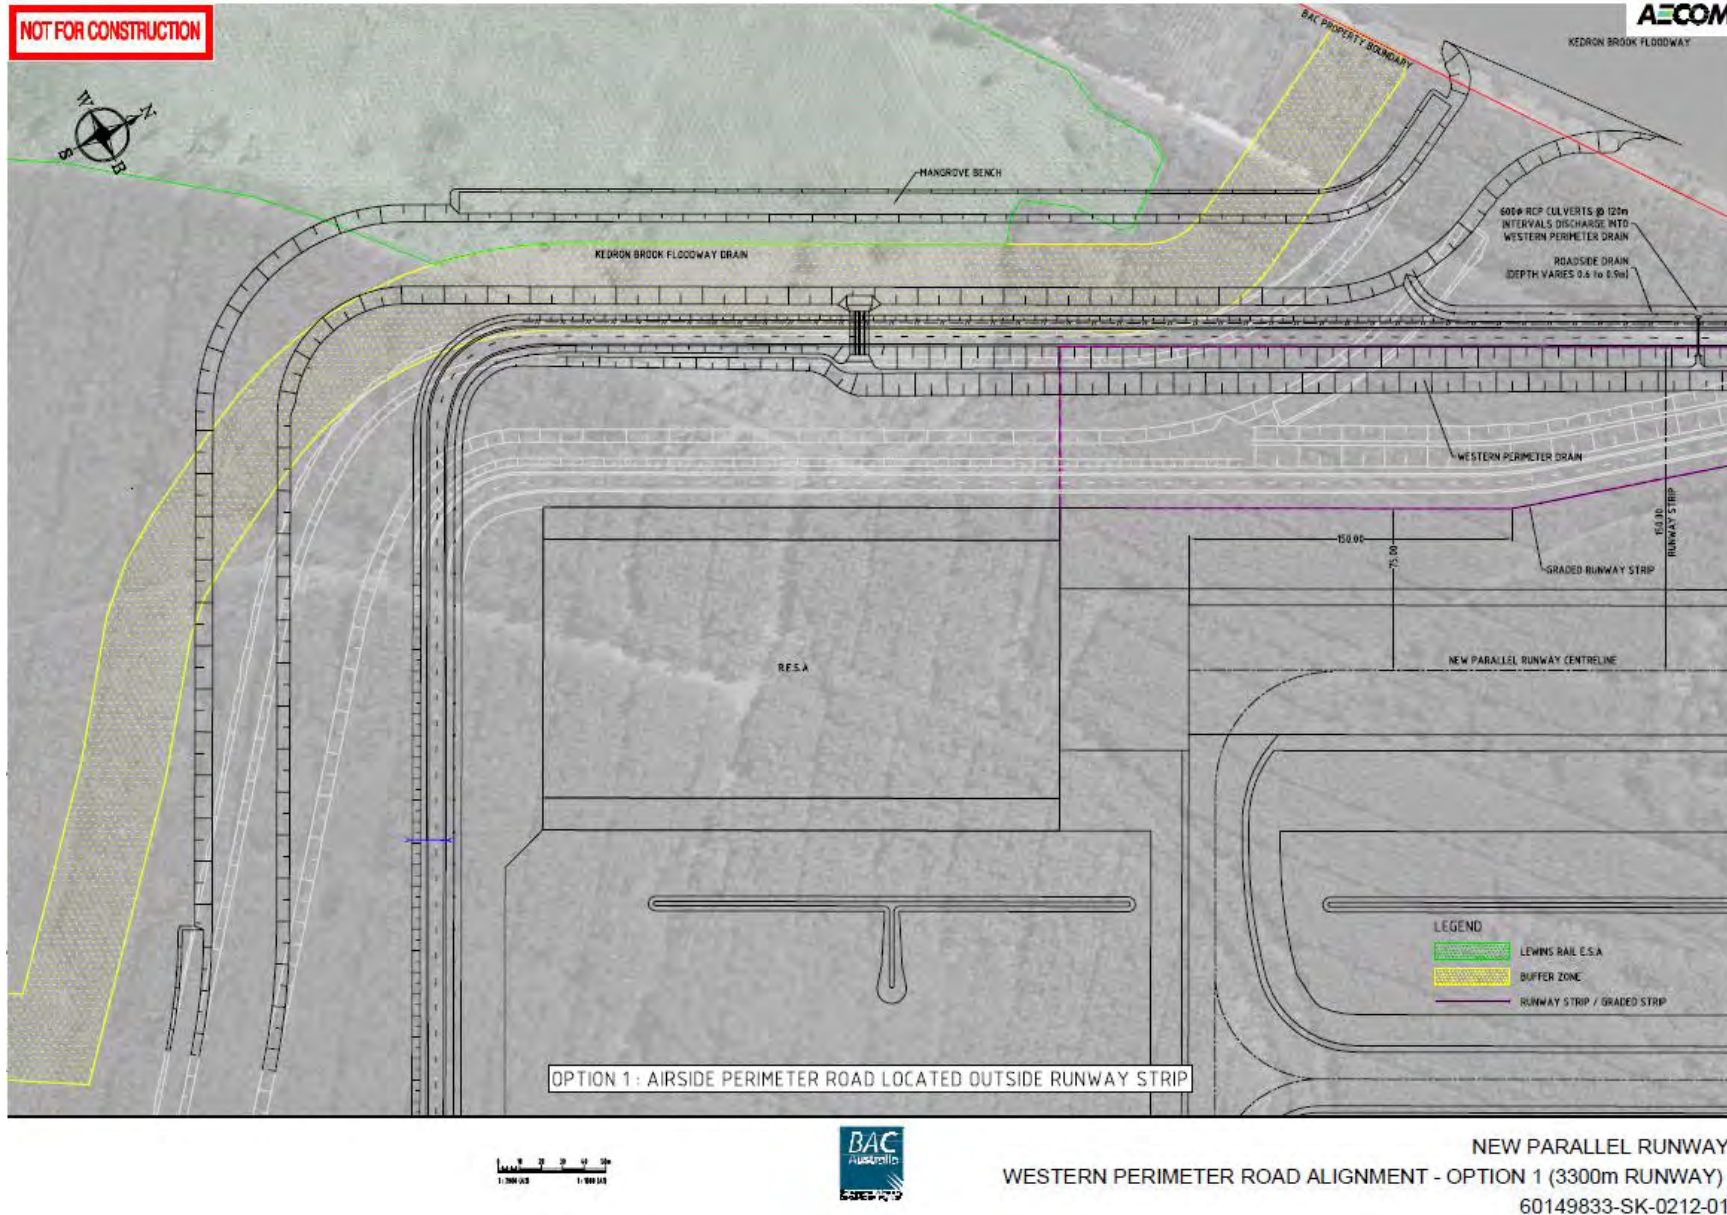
Airside Perimeter Road outside the Runway Strip – KBF D pushed west into ESA
